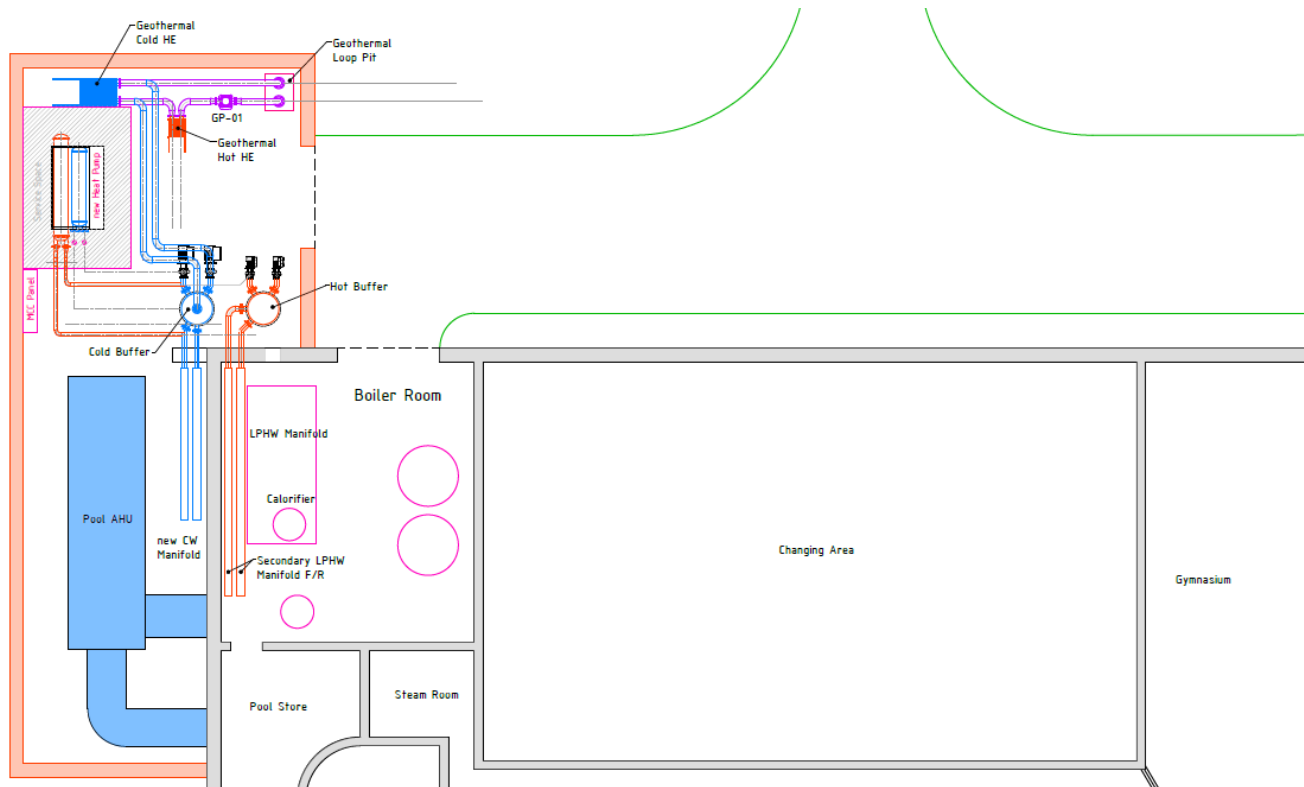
SRSC Plant room extension schematic showing location of the heat pump and ancillary equipment.
